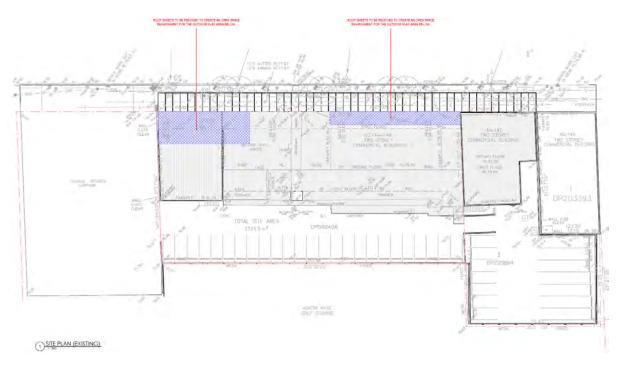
Roof sheets to be removed to facilitate outdoor play areas 1 and 2.
